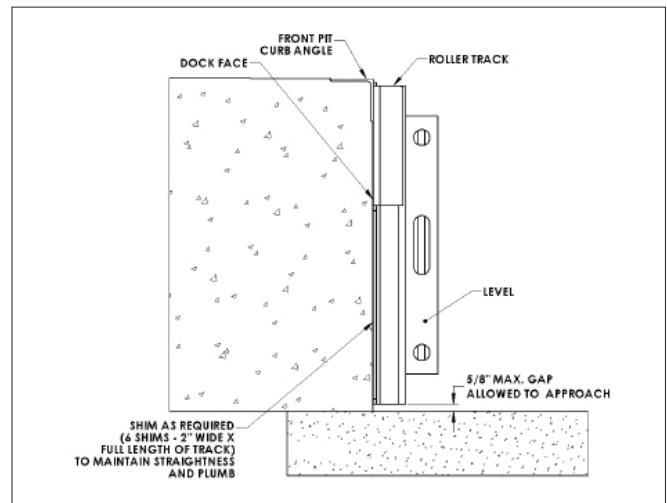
WELDING ROLLER TRACK SIDE VIEW
